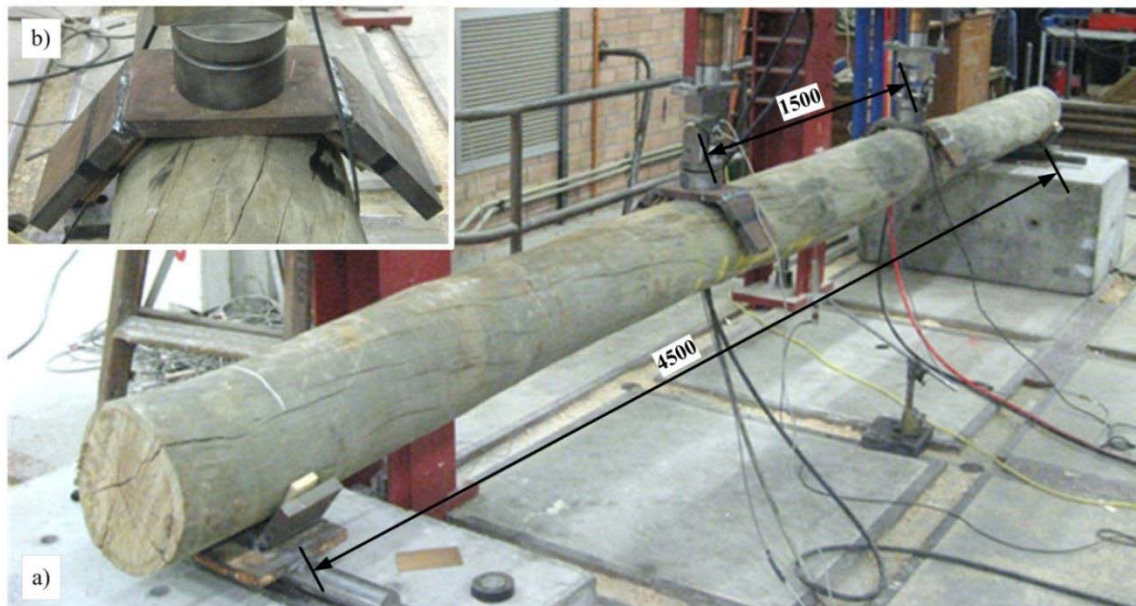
(a) 4-point bending test setup with (b) custom built pole supports (dimensions in mm)
